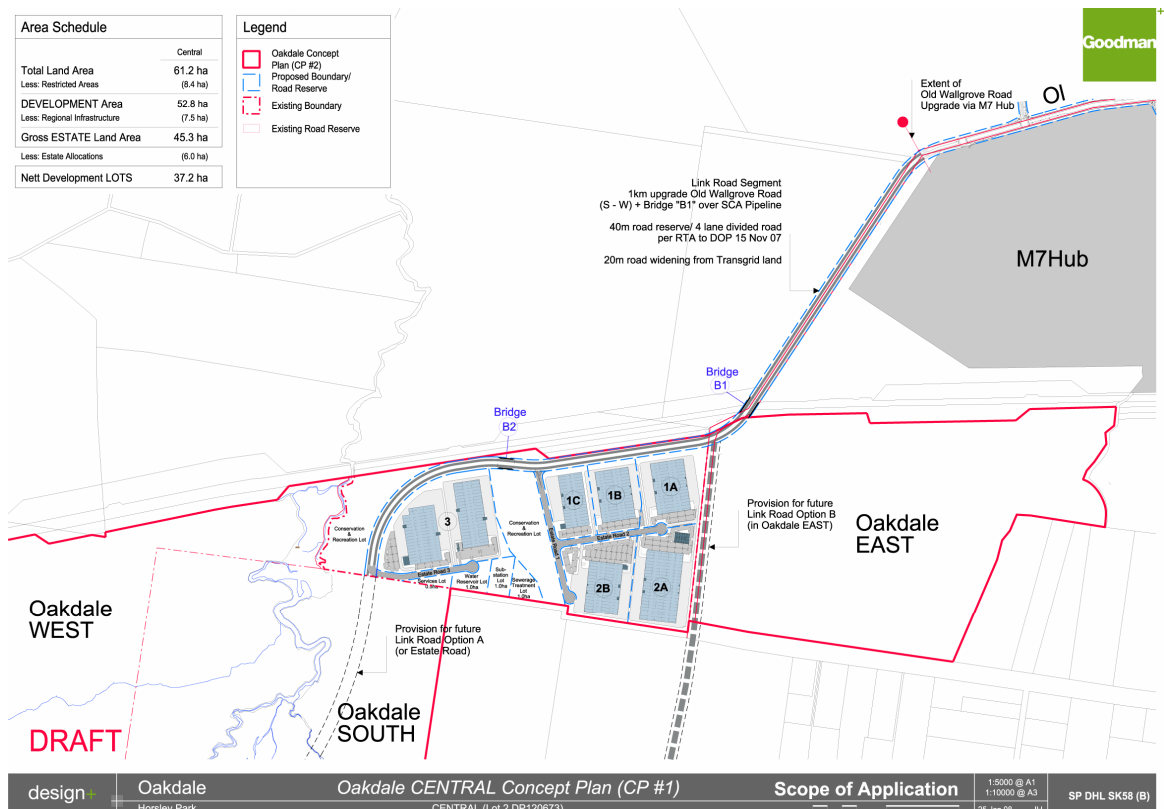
“Oakdale CENTRAL” Concept Plan (CP#1) - Scope of Application
